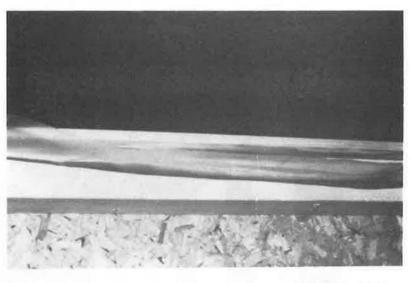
Air/vapor barrier between floor joists. Polyurethane boards were put between joists and caulked to them and to the flooring above. The wall air/vapor barrier ends on the bottom of the floor joists.
